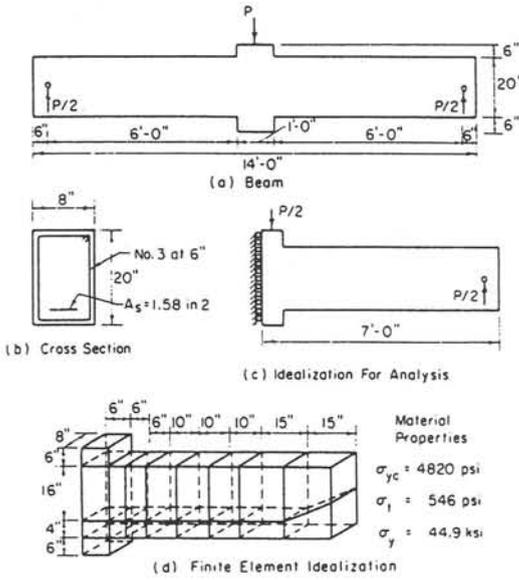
Dimensions of Simple Beam Specimen and Finite Element Idealization (Suidan, 1973)
